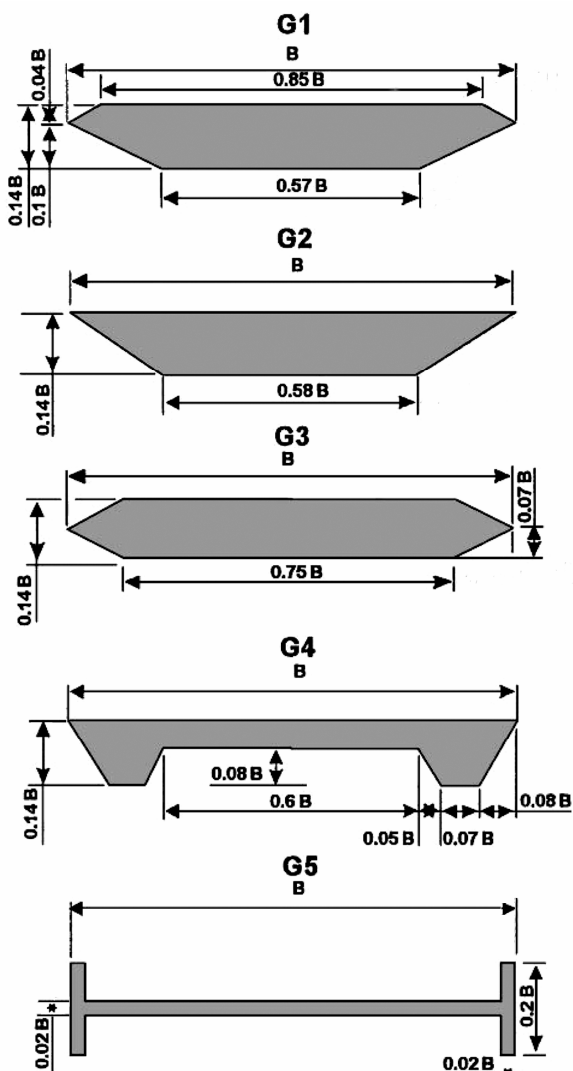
The five long-span bridge deck sections G1 to G5 used.
